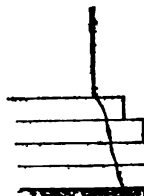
Crack in Footing Course from Excessive Offset
